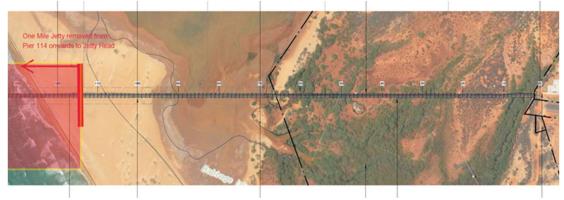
Jetty showing Pier Numbers - Pier 1 is at the abutment - Pier 114 is the extent of the remaining jetty
